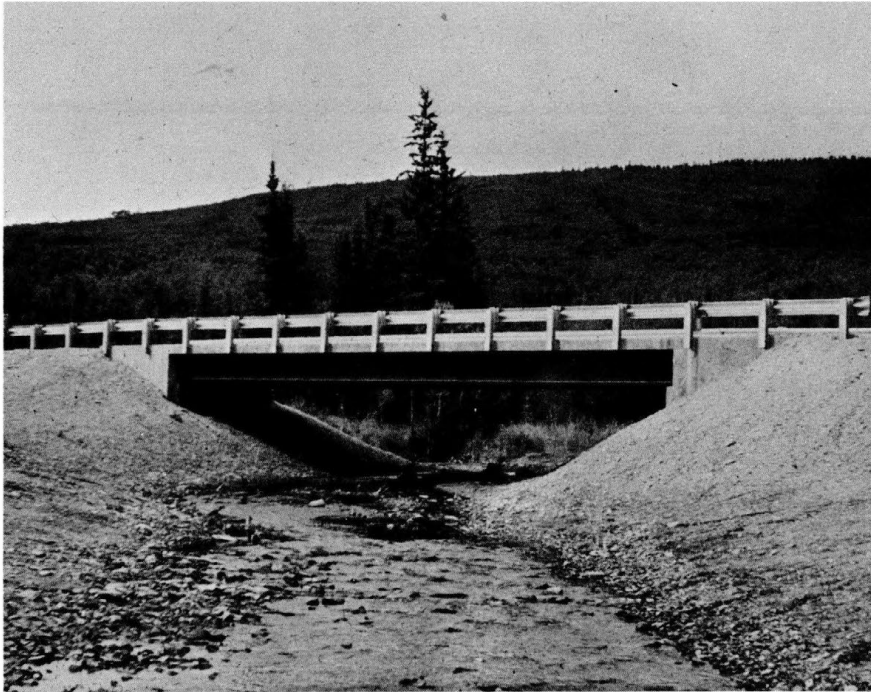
Anti-heave backfill for piles, Spinach Creek.
